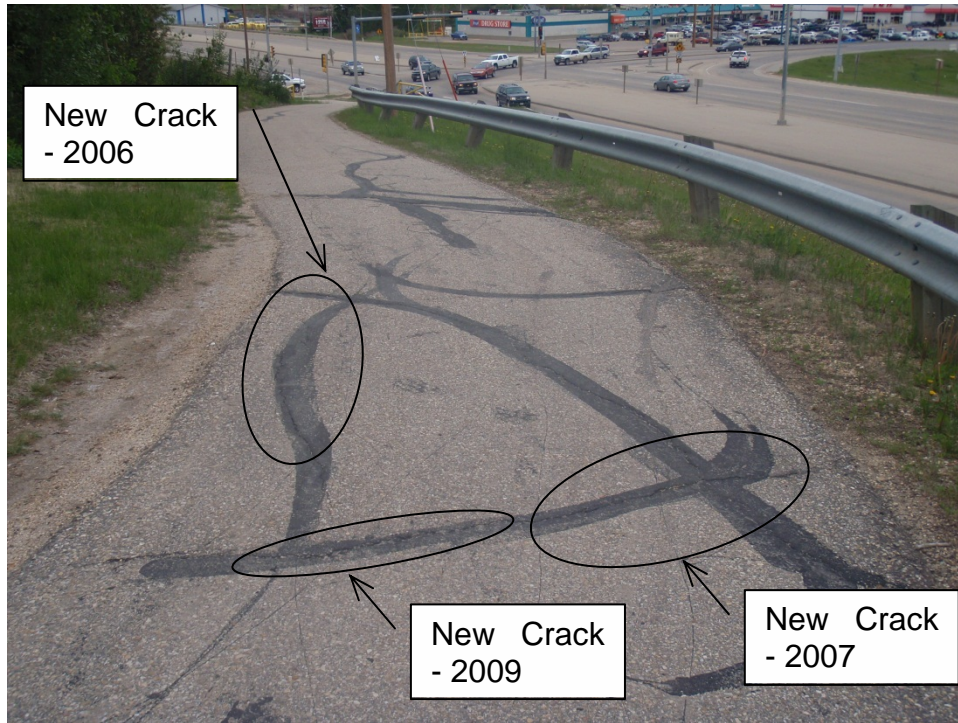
Closer view of new crack to south of existing cracks (June 15, 2010).
